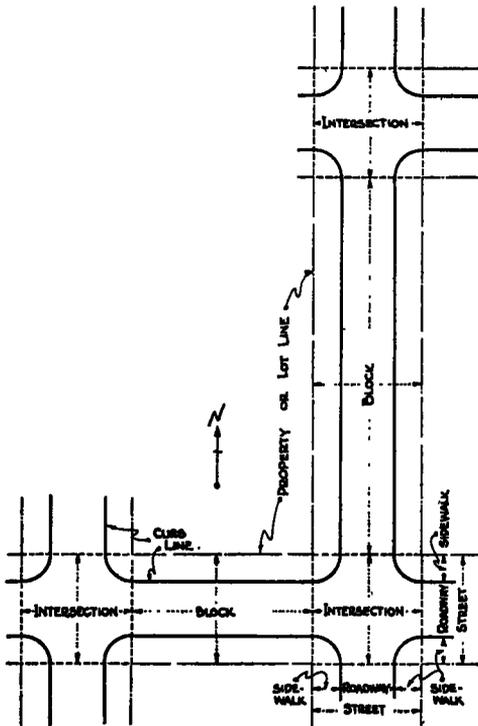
Sample Street Layout Divided into its Component Blocks and Intersections
